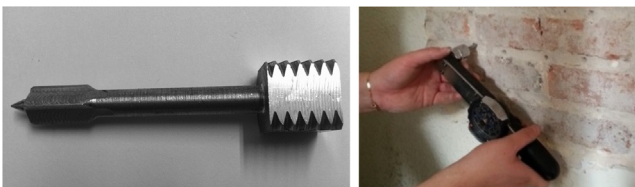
View of the TPT tool and the torque wrench measurement phase [14].
